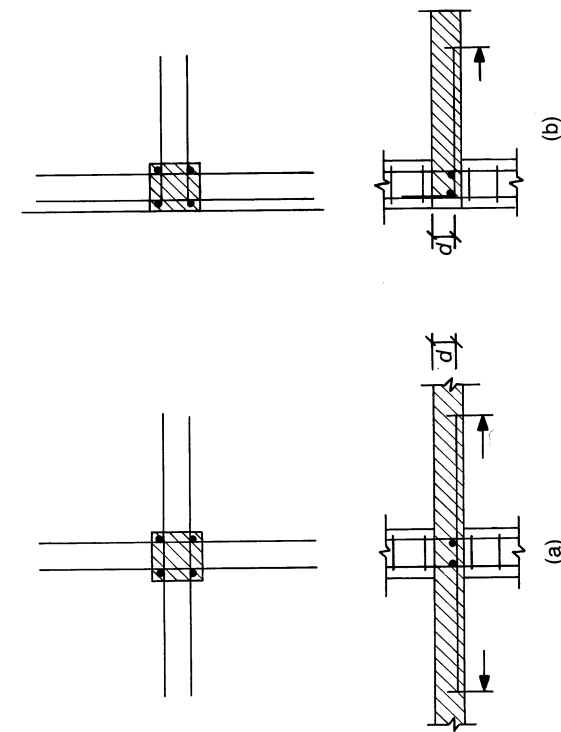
Bottom reinforcement at slab-column interfaces: (a) internal column; (b) edge column
